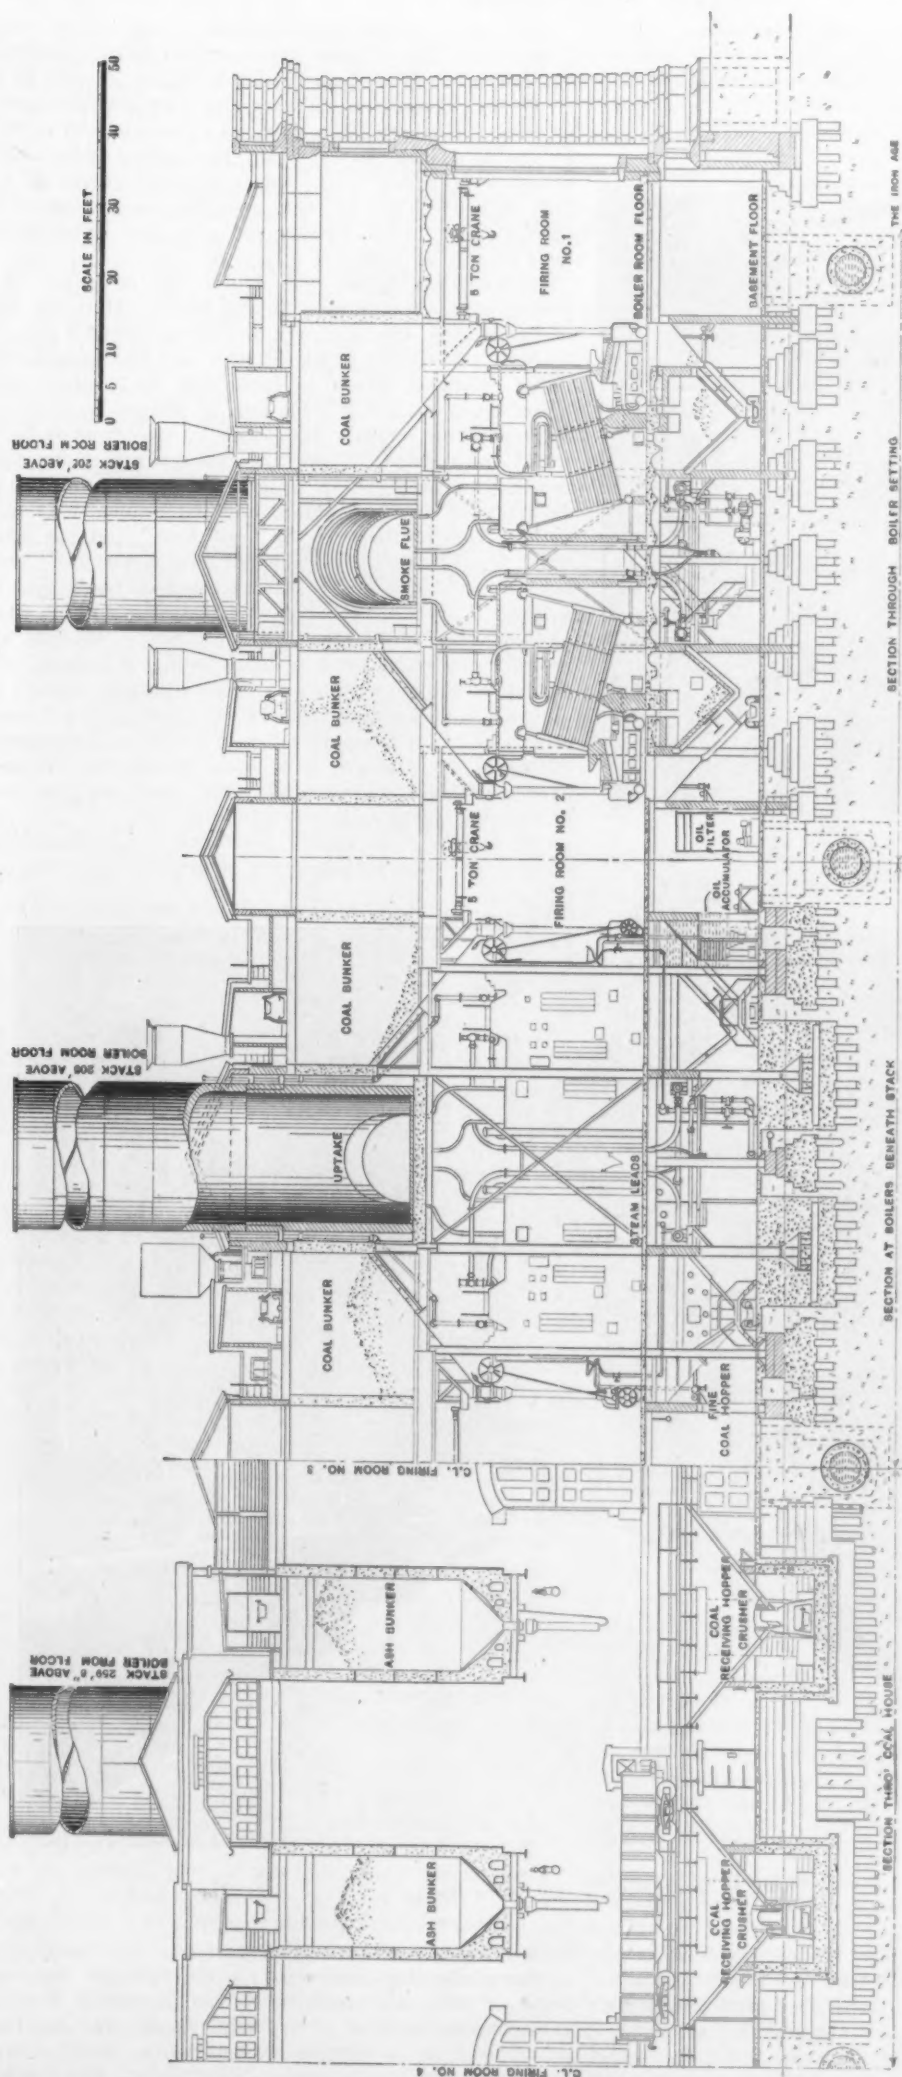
Longitudinal Sections Through the Boiler Room. Taken on Different Planes.
